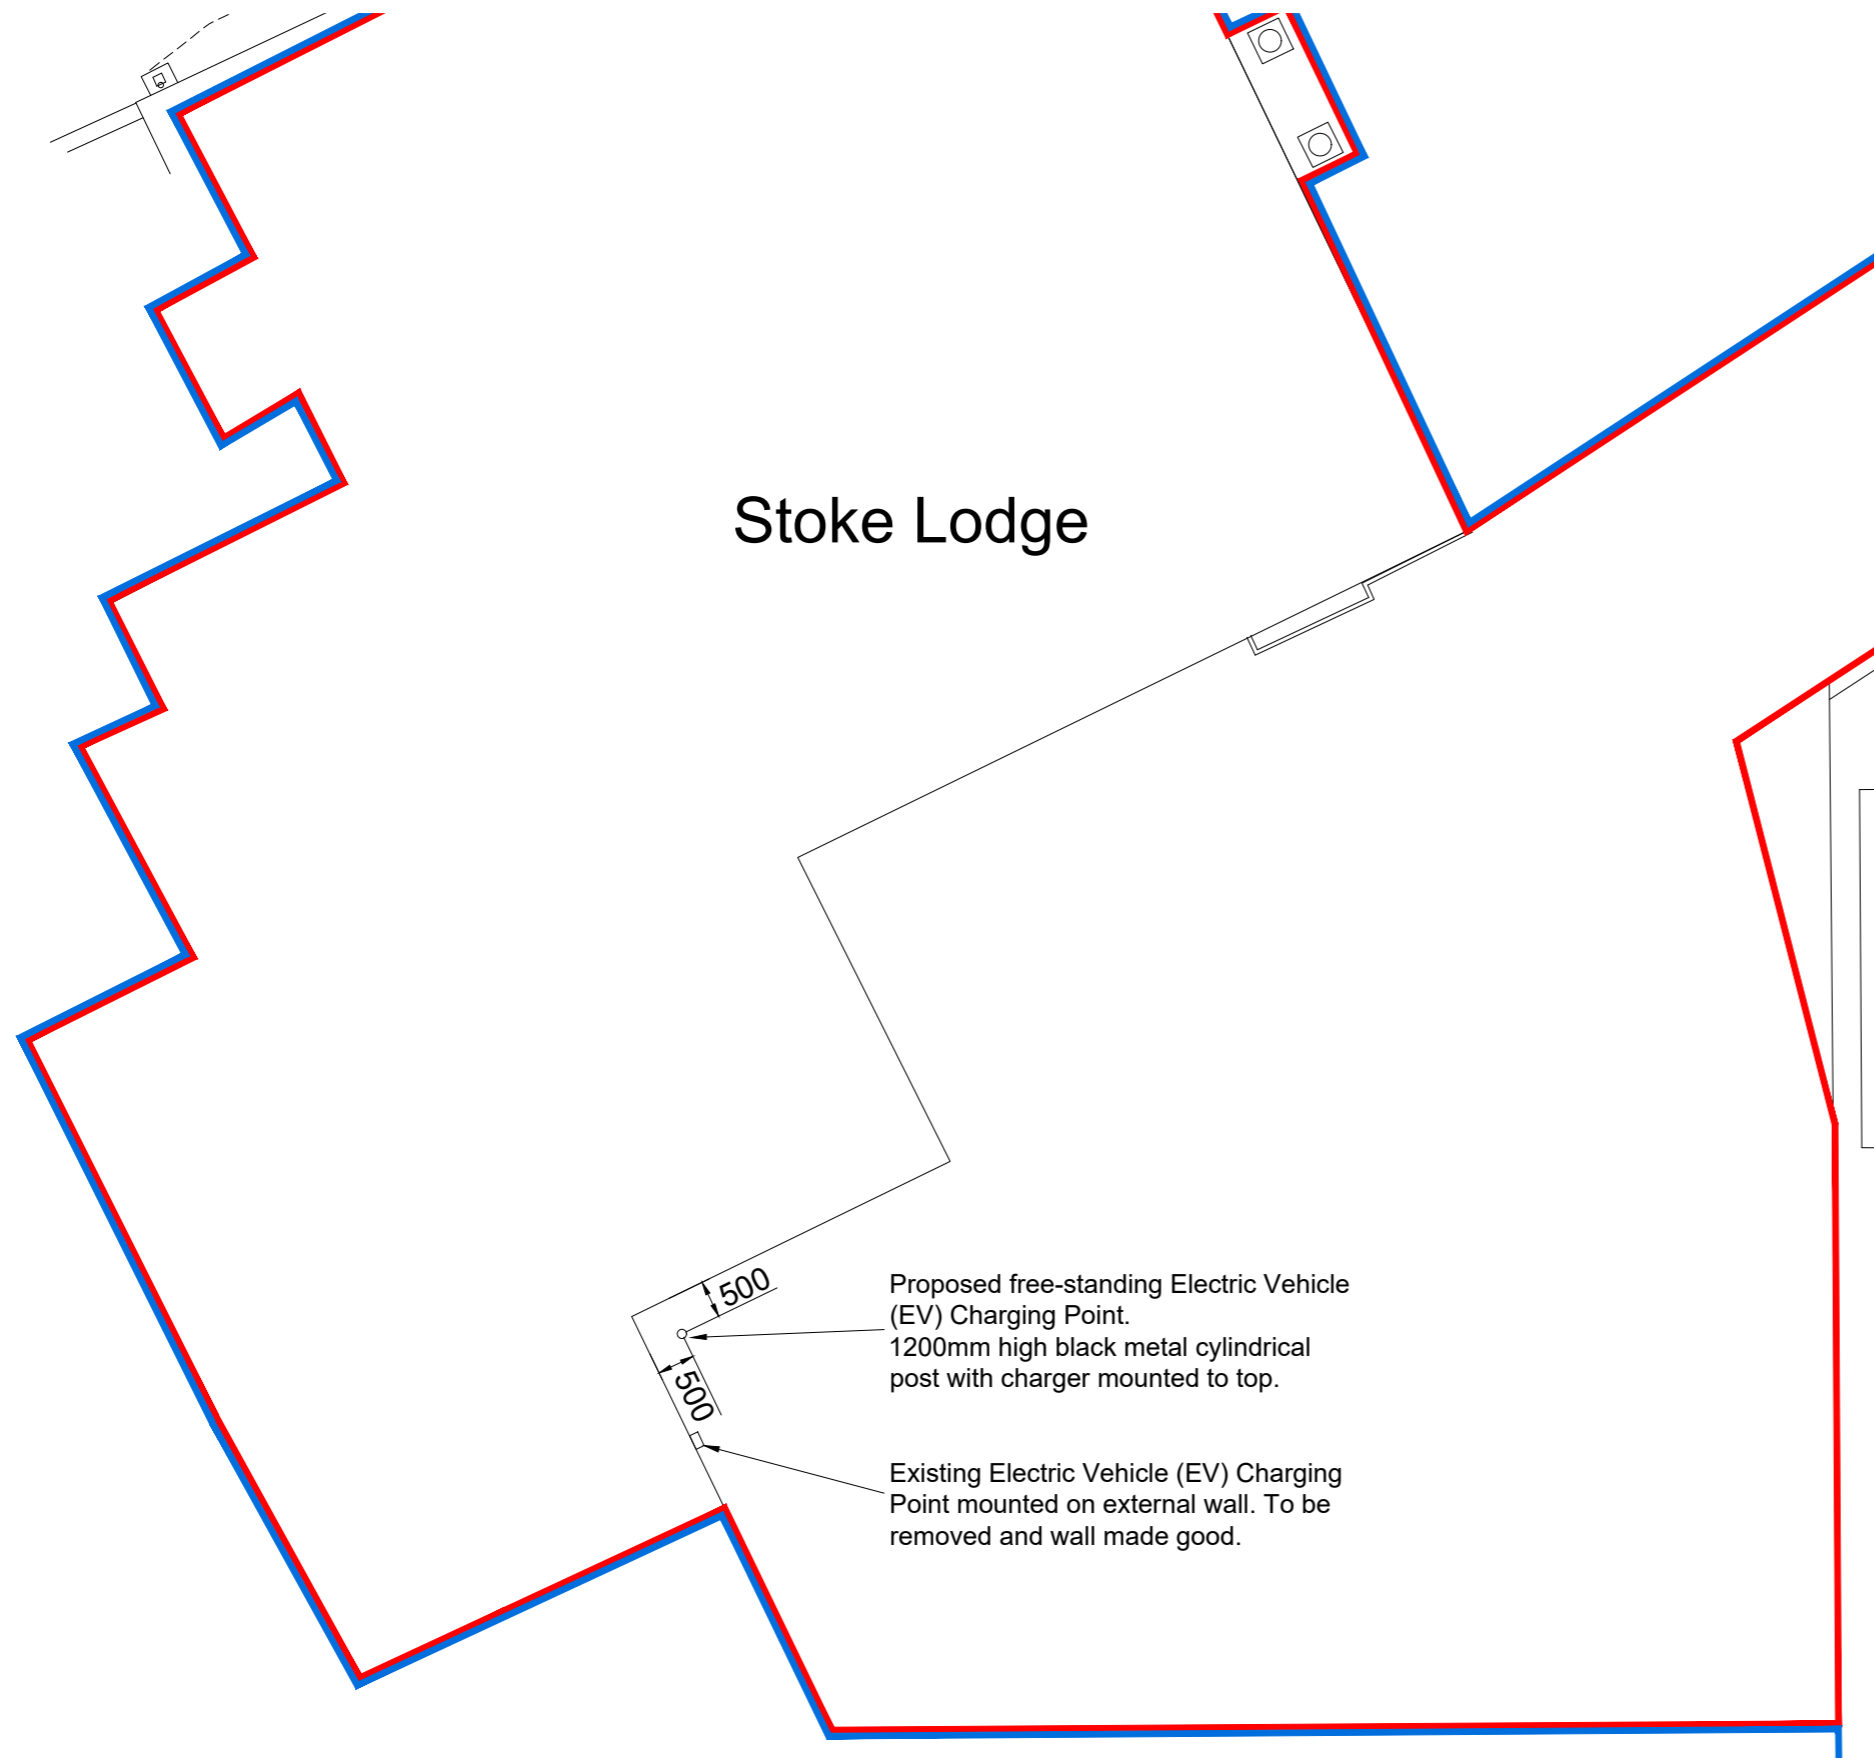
Site plan showing the location of the existing and proposed Electric Vehicle (EV) Charger.
